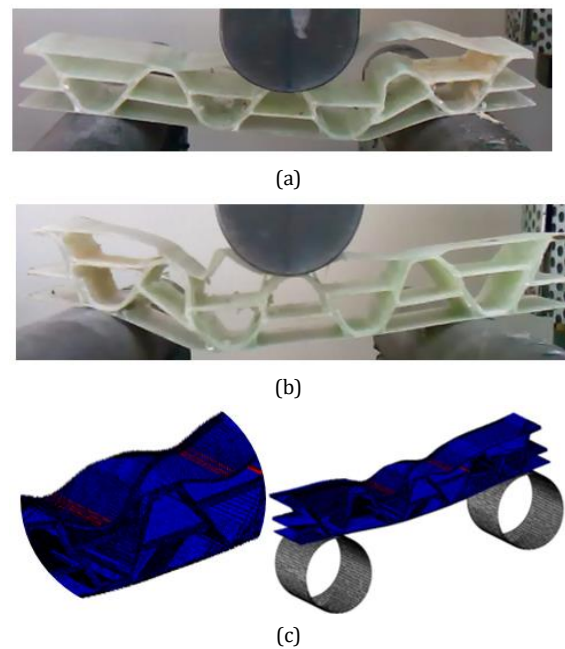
Failure modes of the transverse specimens with the reinforcement sheet: (a) specimen 1; (b) specimen 2; (c) FE simulation.
